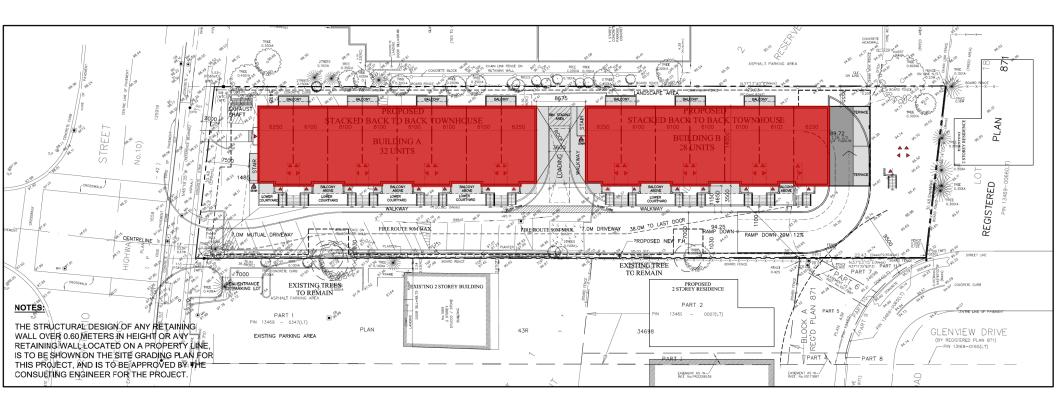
Proposed Site Plan Showing Ventilation Requirements
